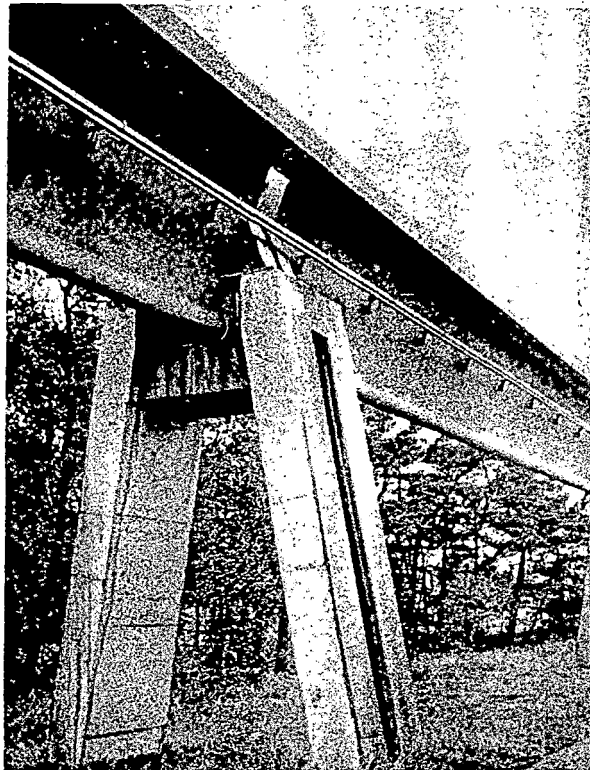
Photograph of Steel Guideway at Emsland Test Track, Germany
